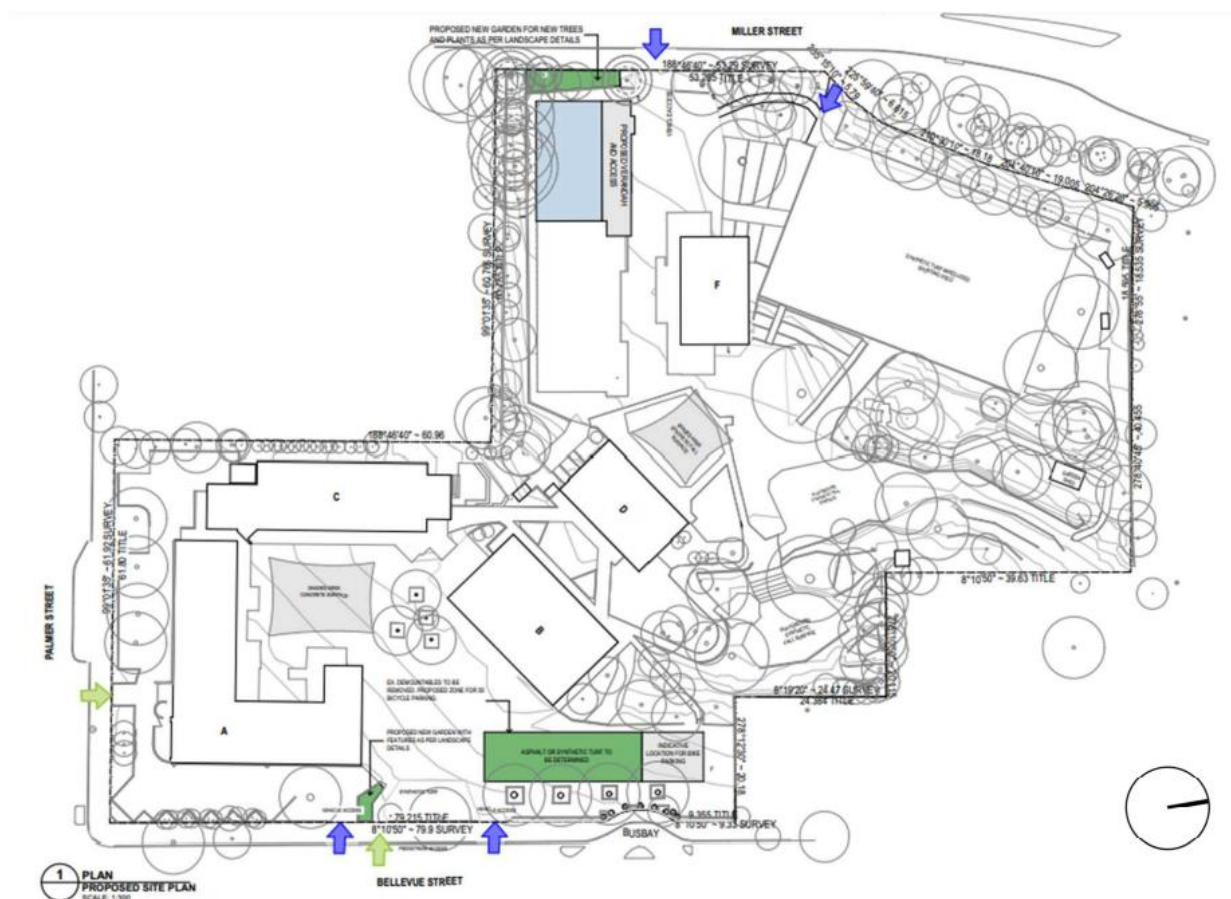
Proposed scope of works (Source: Fulton Trotter Architects, Proposed Site Plan (Rev P6))
